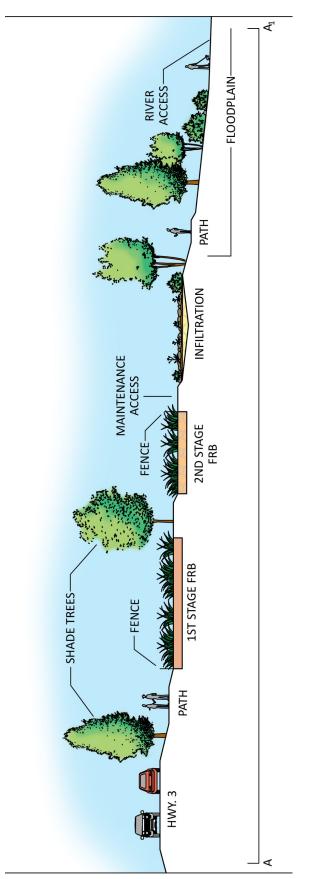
Section elevation illustrating integration of multiple uses above the base flood elevation.
